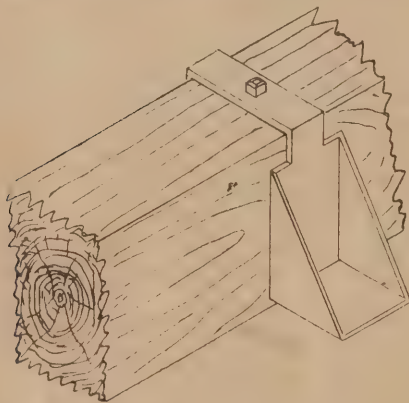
FLOORS. A STIRRUP FOR BINDING JOIST.
